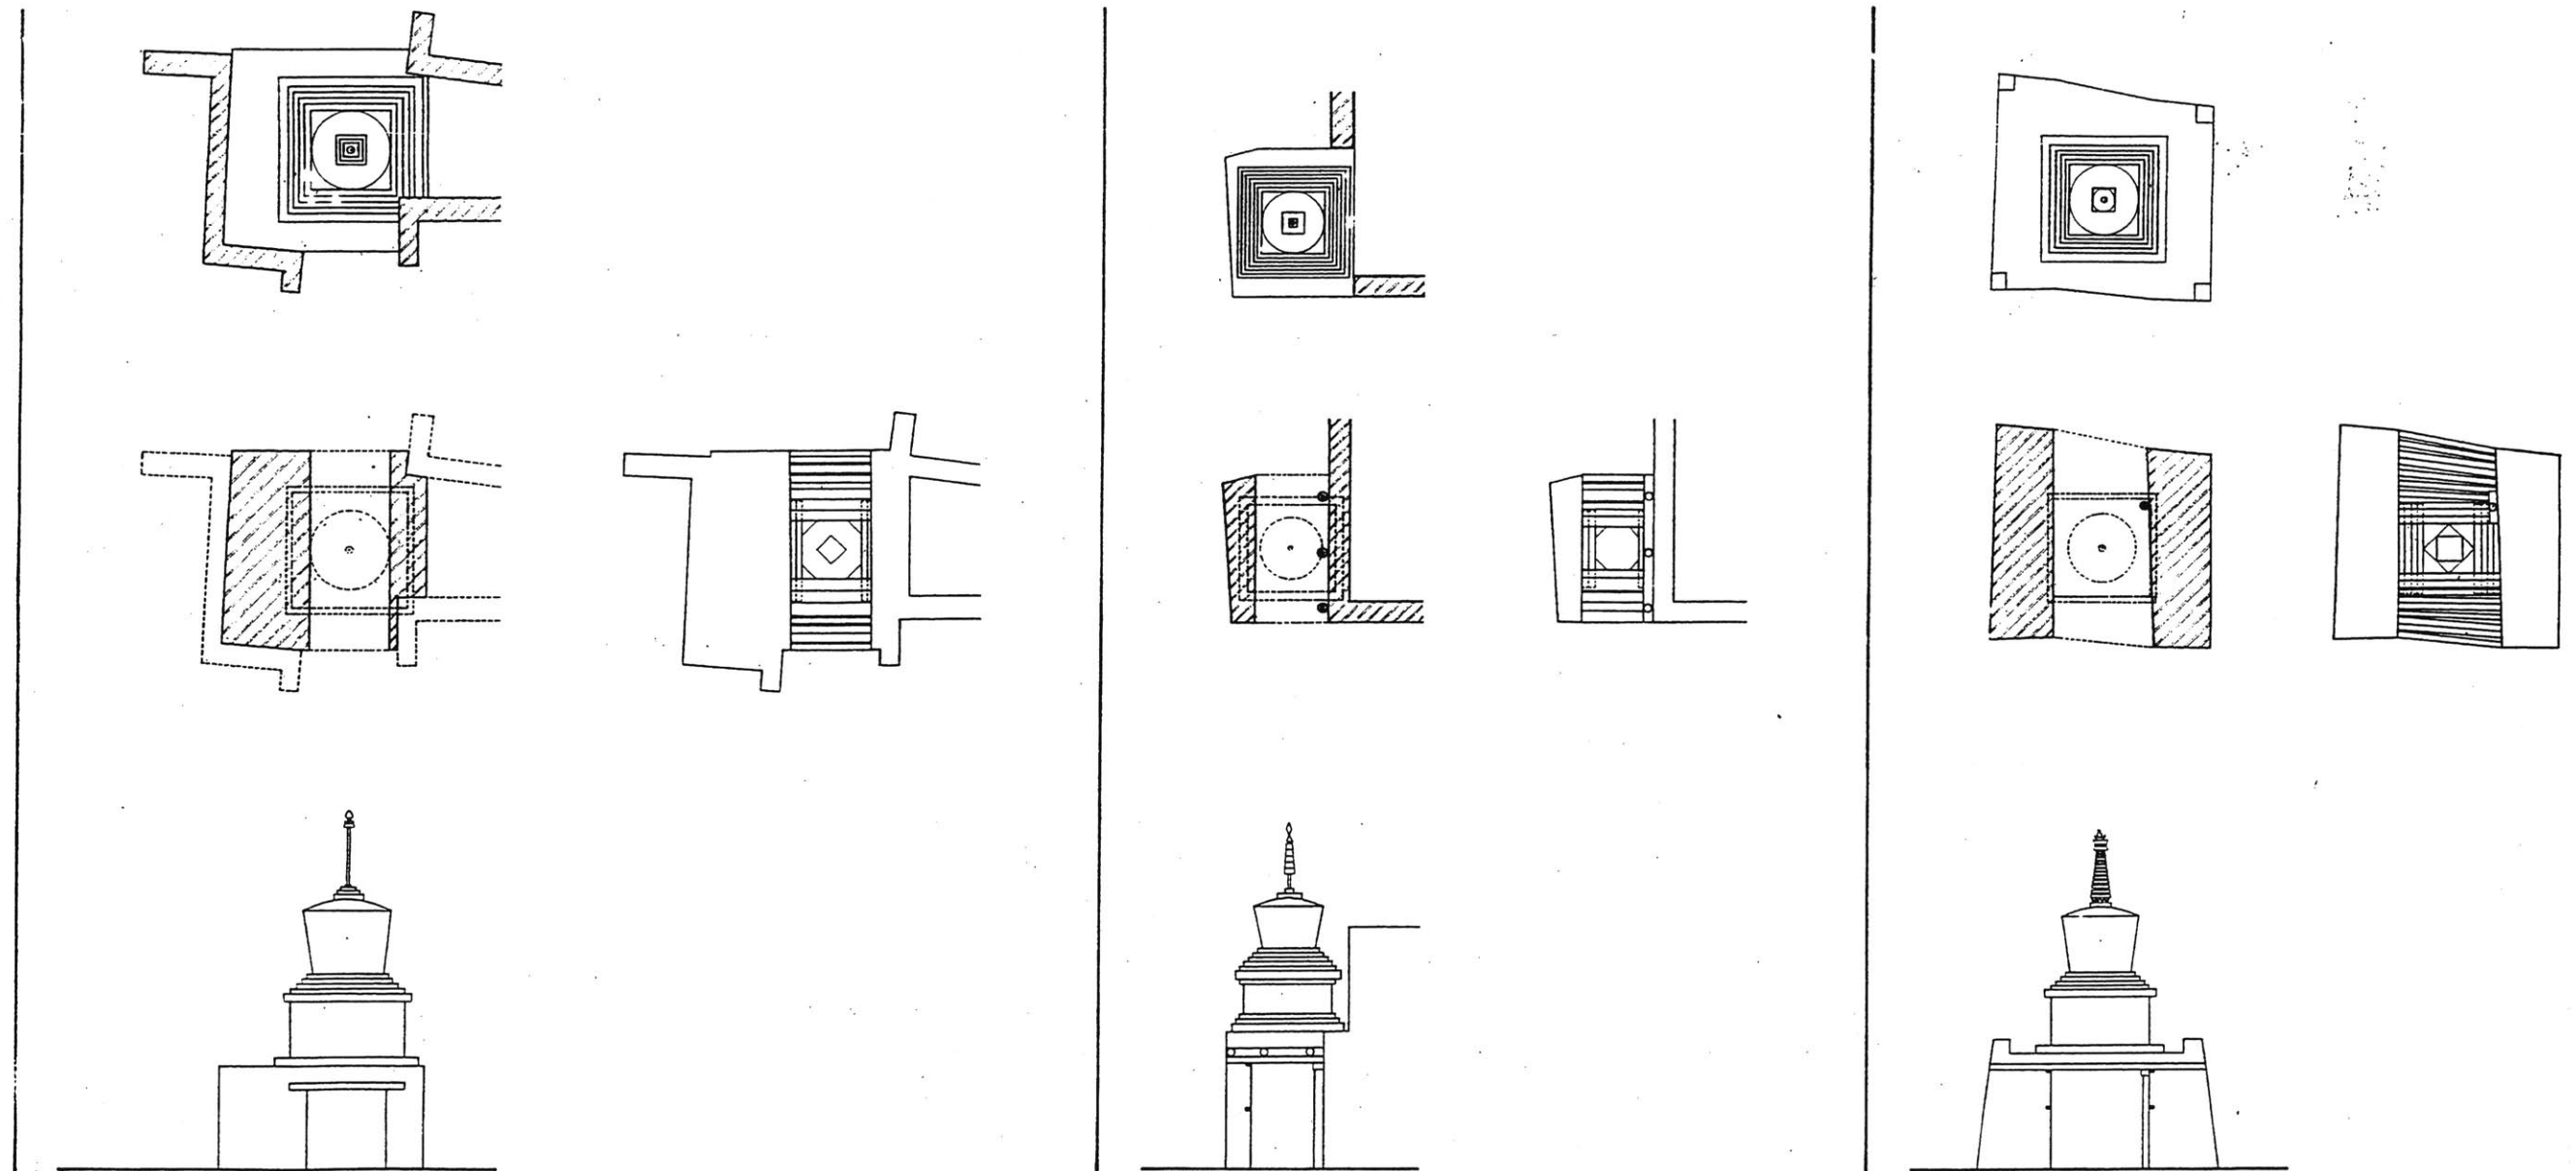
The three 'chorten' gateways: plans, inverted ceiling plans and elevations
